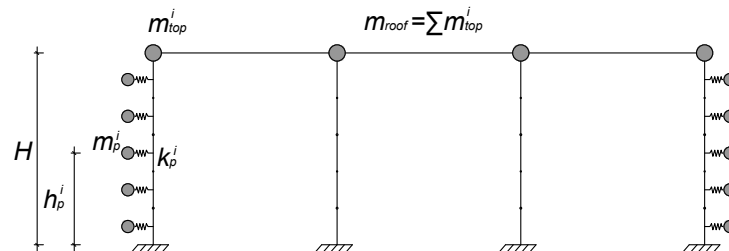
Structural system considered for the evaluation of the out-of-plane loads on cladding panels.
